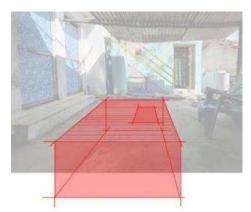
People's idea of building an underground water tank – Hauj Source: Author
